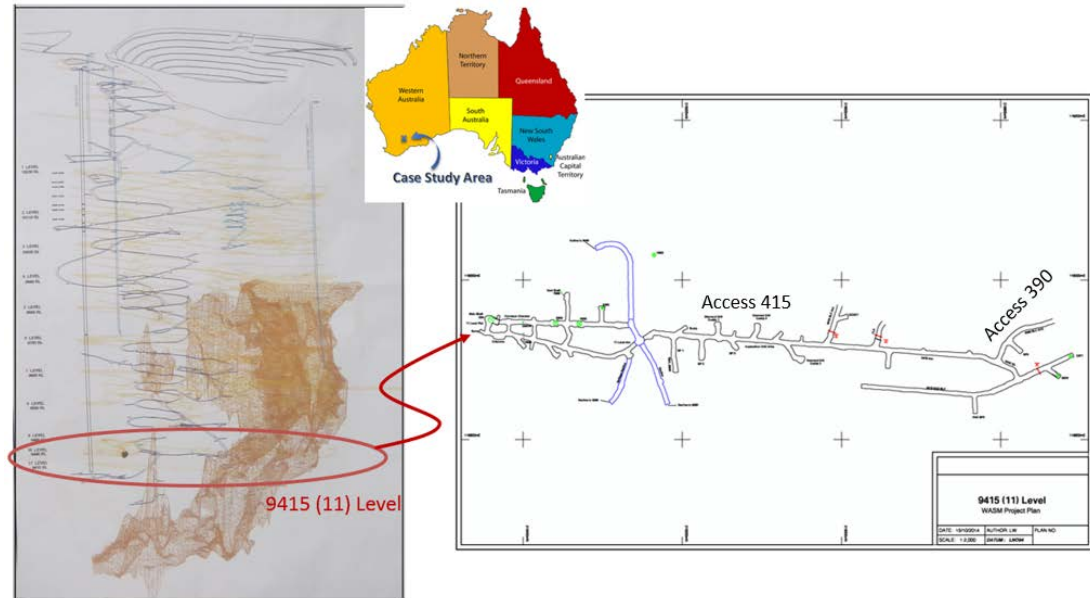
Layout of test location in tunnel 11 at level 9415m
